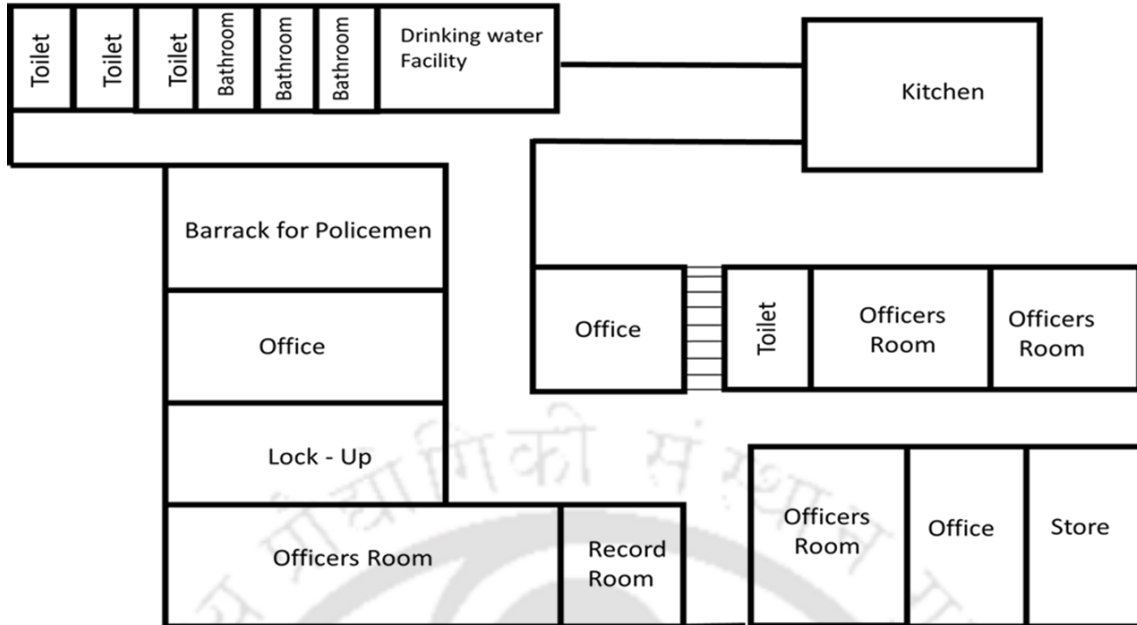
Overview of an existing CPS Pan Bazar Guwahati with the floor plans
